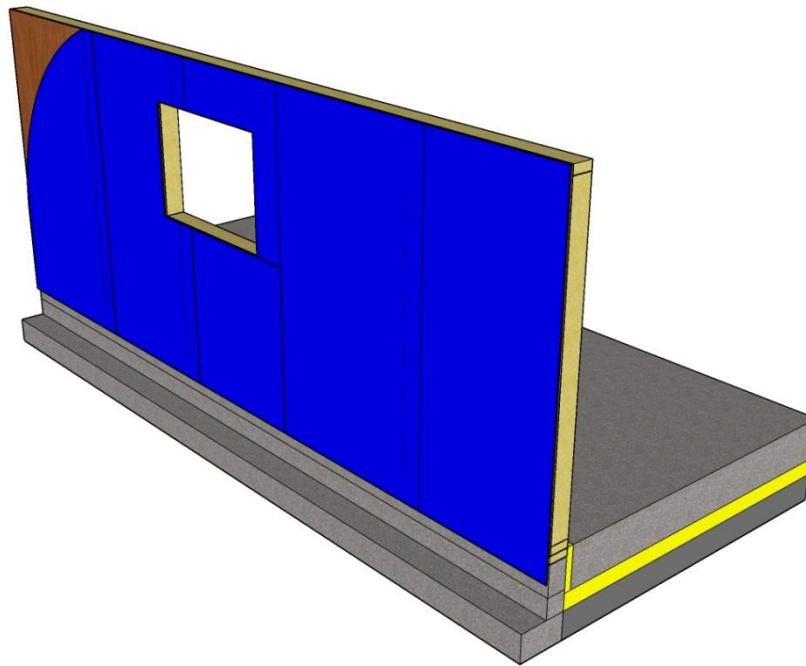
Image of breather membrane (Blue) installed on the external side of the timber frame wall
